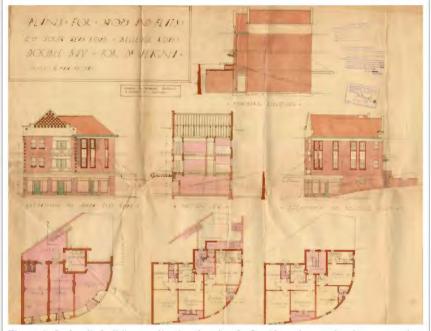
Orchard's building application drawing for Dr Alagna's new development at the corner of New South Head Road and Bellevue Road approved by Woollahra Council in August 1928.
